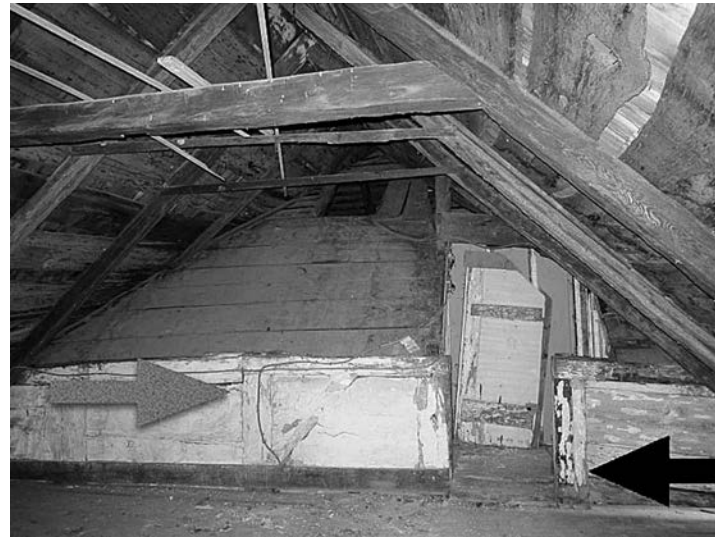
View of kitchen ell garret looking north. Photo by author, 2014.
